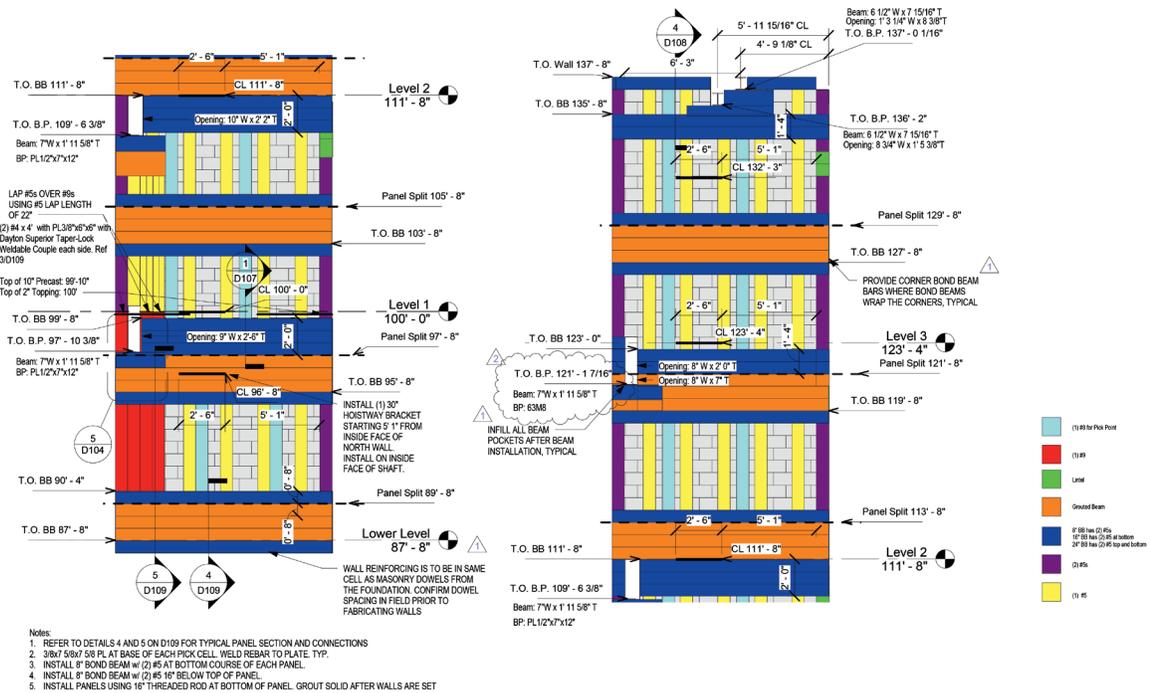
St. Camillus 3D model showing grout, rebar and bond beams generated by Revit model
